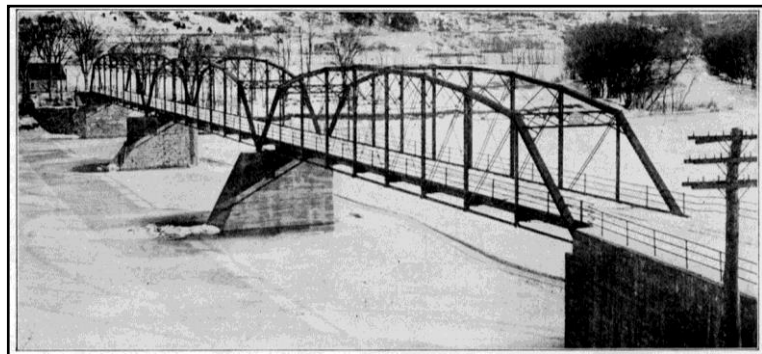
"Ascutney Bridge" was a 3-span pin-connected Parker truss over the Connecticut River between Claremont NH and Weathersfield VT. Designed by John Storrs, built by United Construction Company in 1908; replaced in 1969. This bridge replaced the 1837 Claremont Toll Bridge, destroyed by freshet and ice in 1901. Photo from Storrs Bridge Handbook, 1918. See also Portfolio Figures 11, 12.
